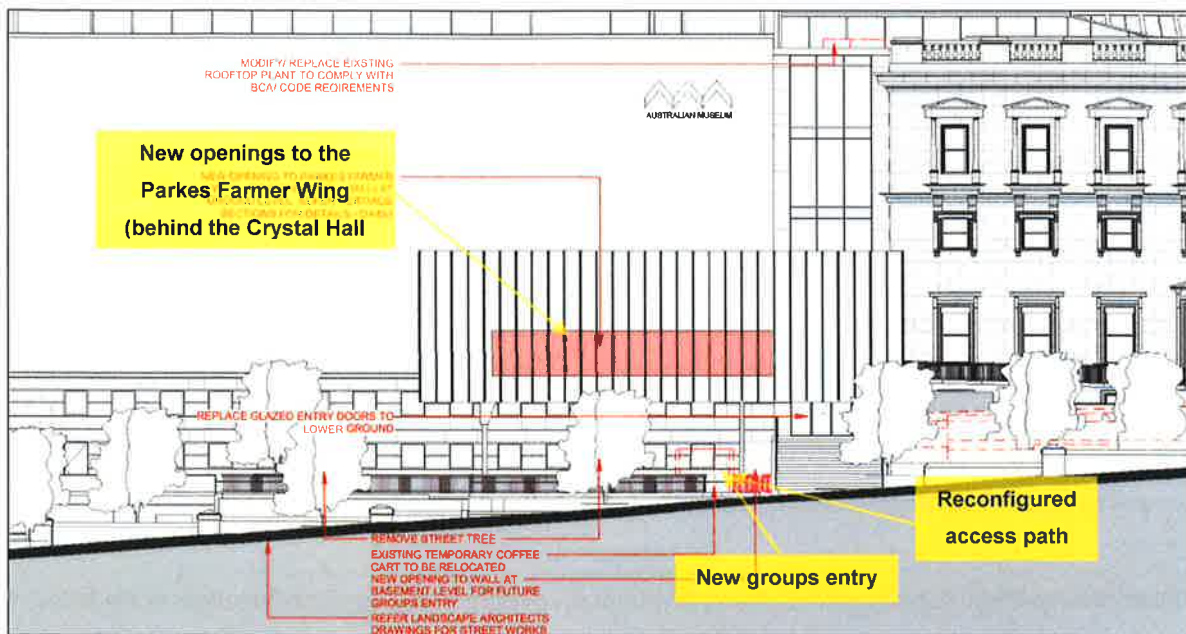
| Front elevation showing external changes (Source: Applicant's RtS).
